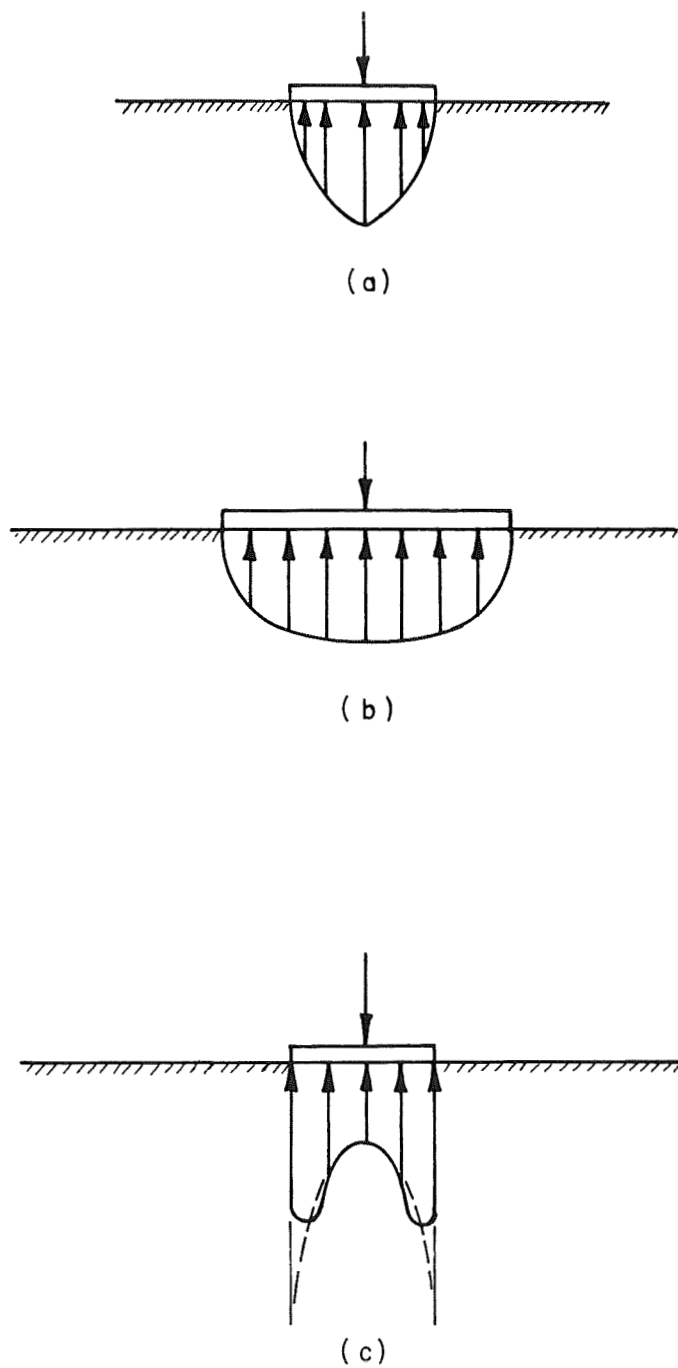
PRESSURE DISTRIBUTION BENEATH STATICALLY LOADED RIGID FOOTINGS. (a) COHESIONLESS SOIL; NARROW FOOTING, (b) COHESIONLESS SOIL; WIDE FOOTING, (c) COHESIVE SOIL
